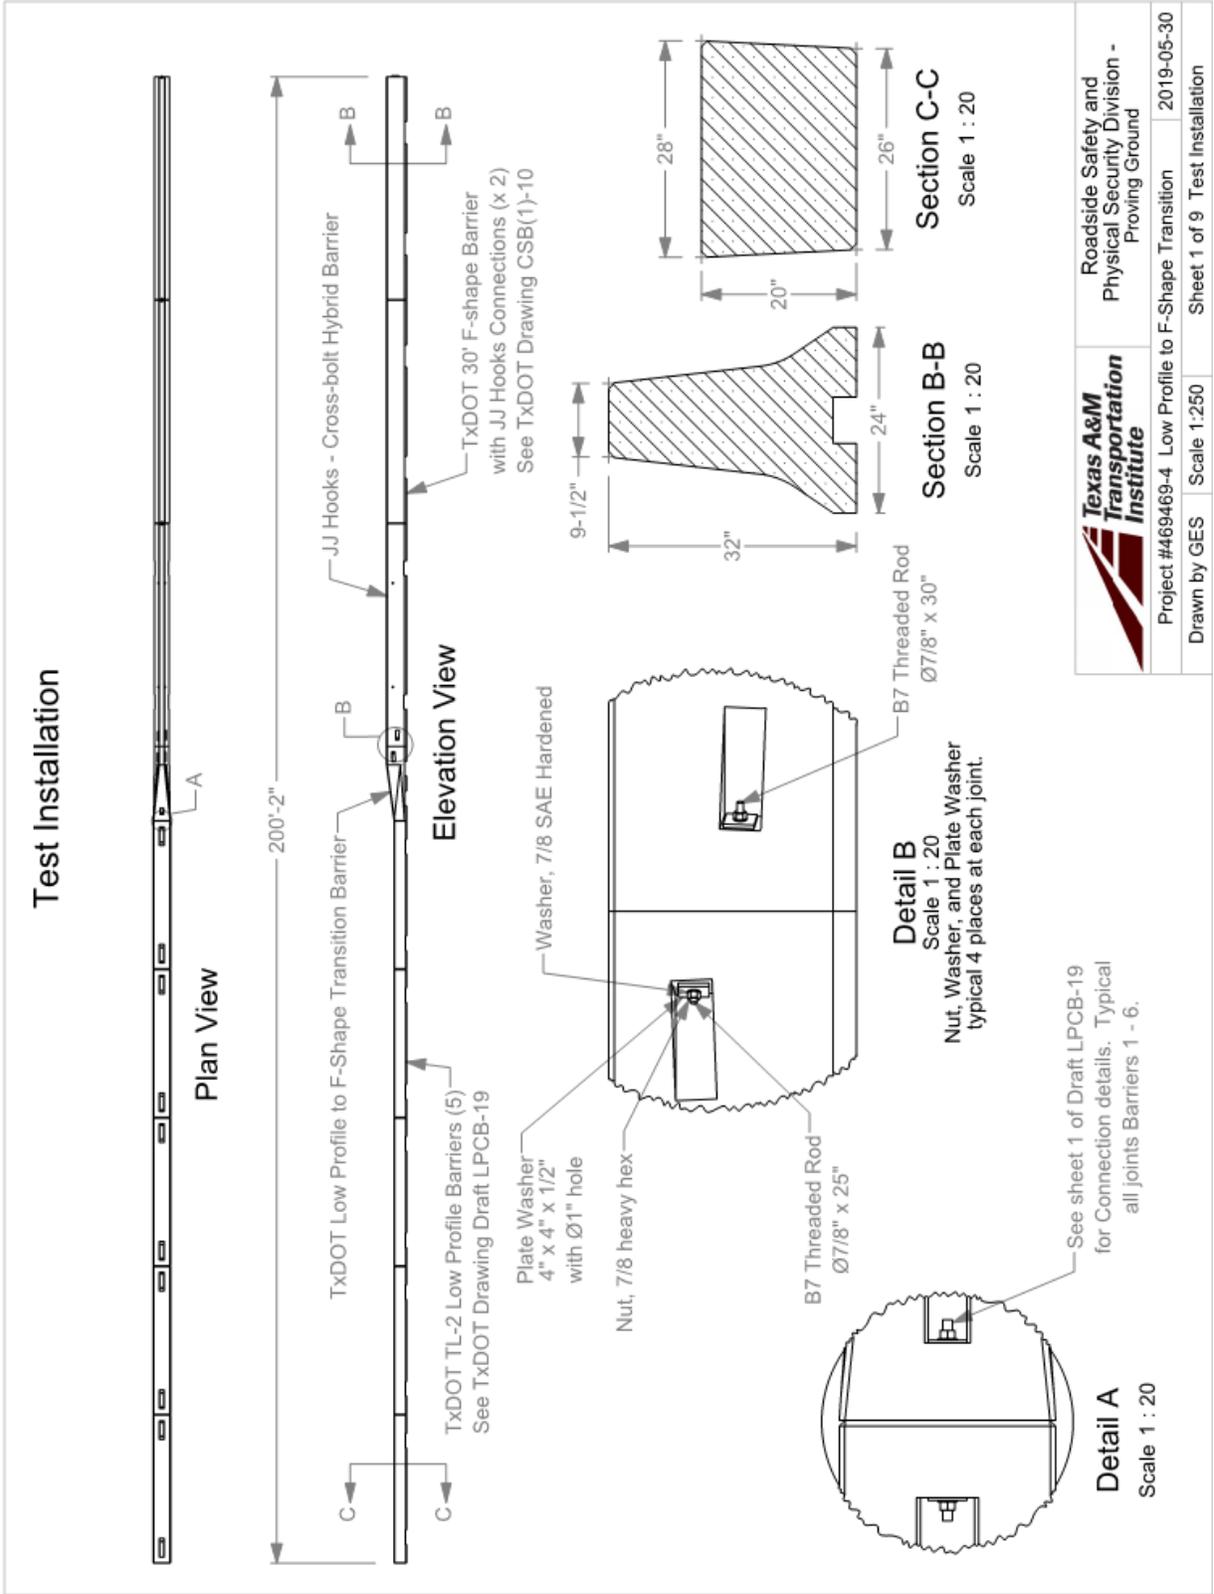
Overall Details of Low-Profile-to-F-Shape Transition.
